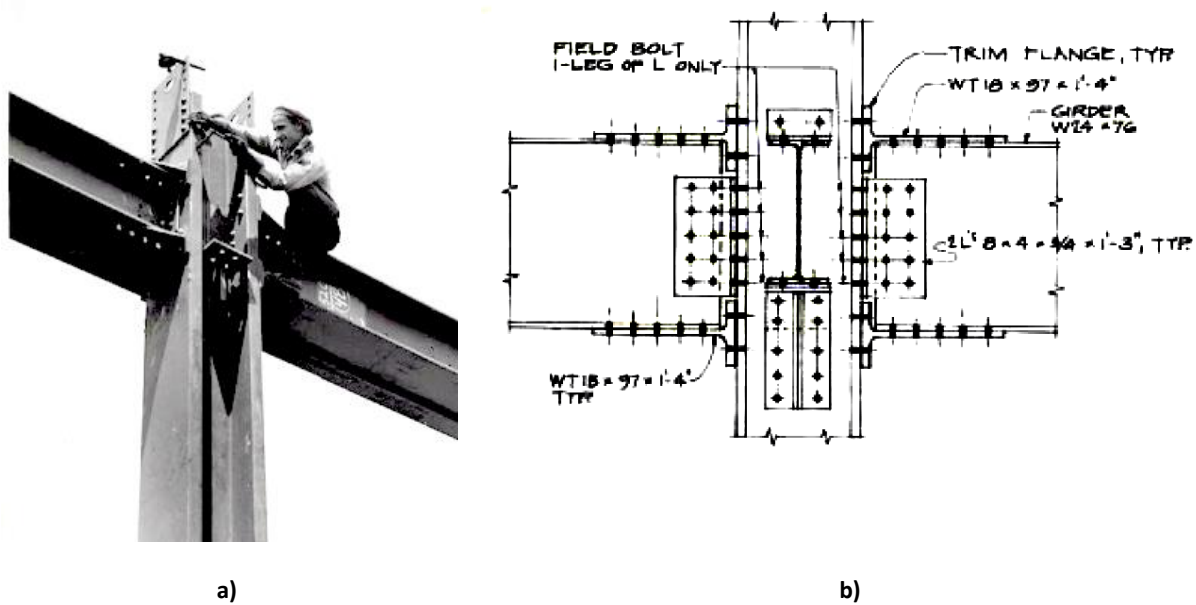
Steel moment frame construction: a) Empire State Building rigid frame beam-column connection being assembled – note the flange plate connectors top and bottom of the beam⁴⁰; b) drawing of typical 1930s beam-column moment connection⁴¹
